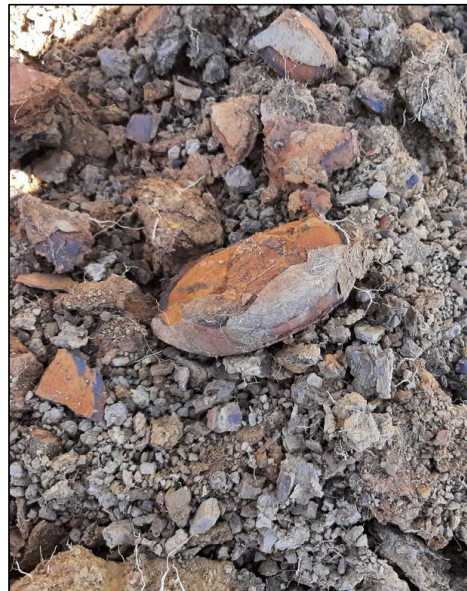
Test pit TP7 – Large, brown and dark grey shale cobbles from ~1.4 mBGL.
